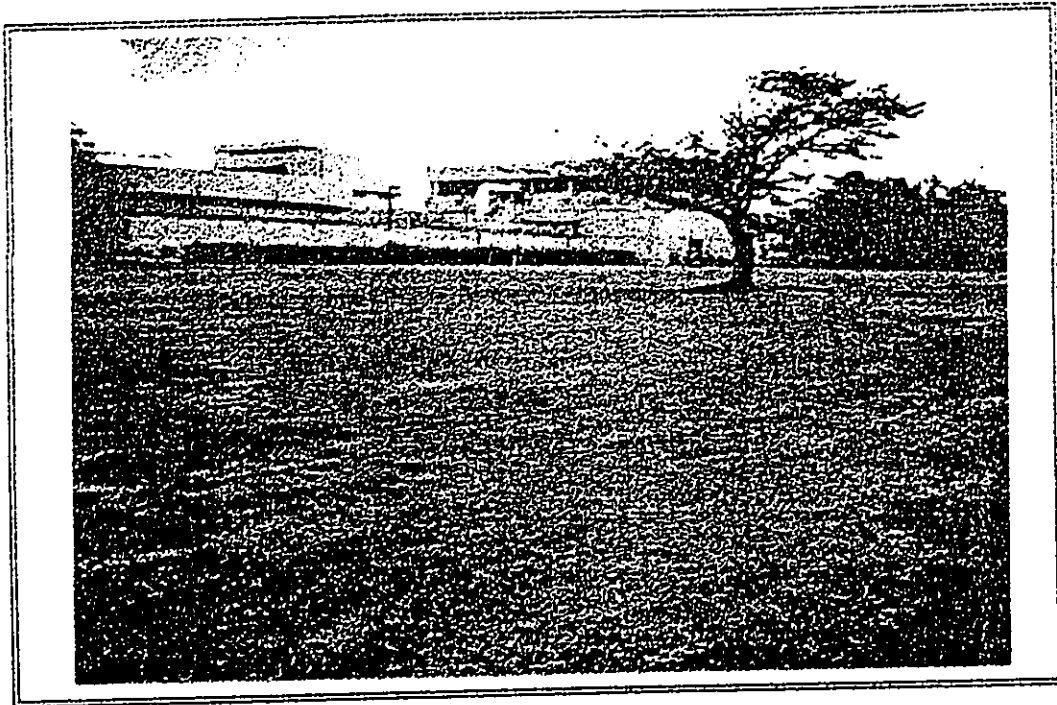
View of proposed Pretreatment Facility area looking south. Influent Screens Building is in the background.
